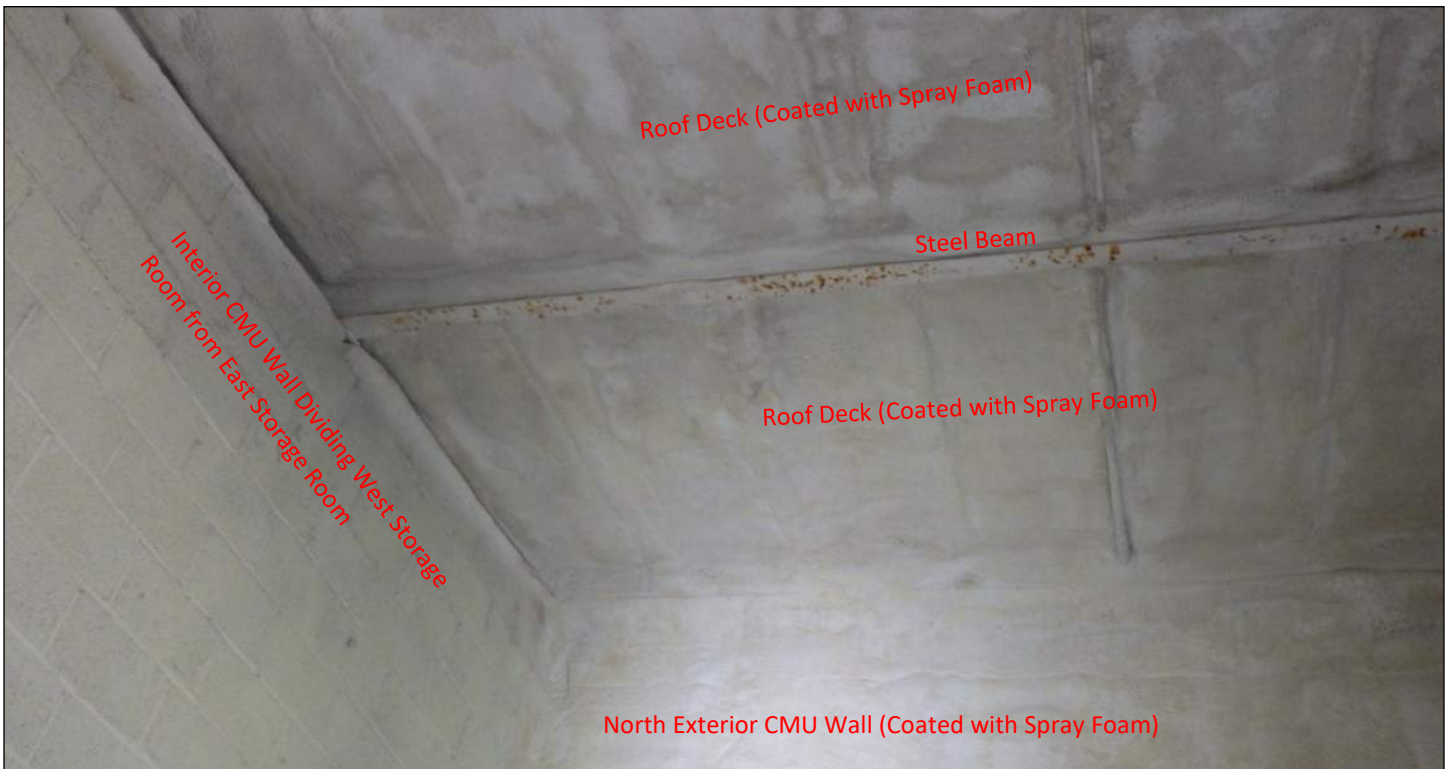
Overview of east storage room, looking up and to the northwest. Note moisture stains on roof deck and north CMU wall. Also note rust spots on steel roof beam.
